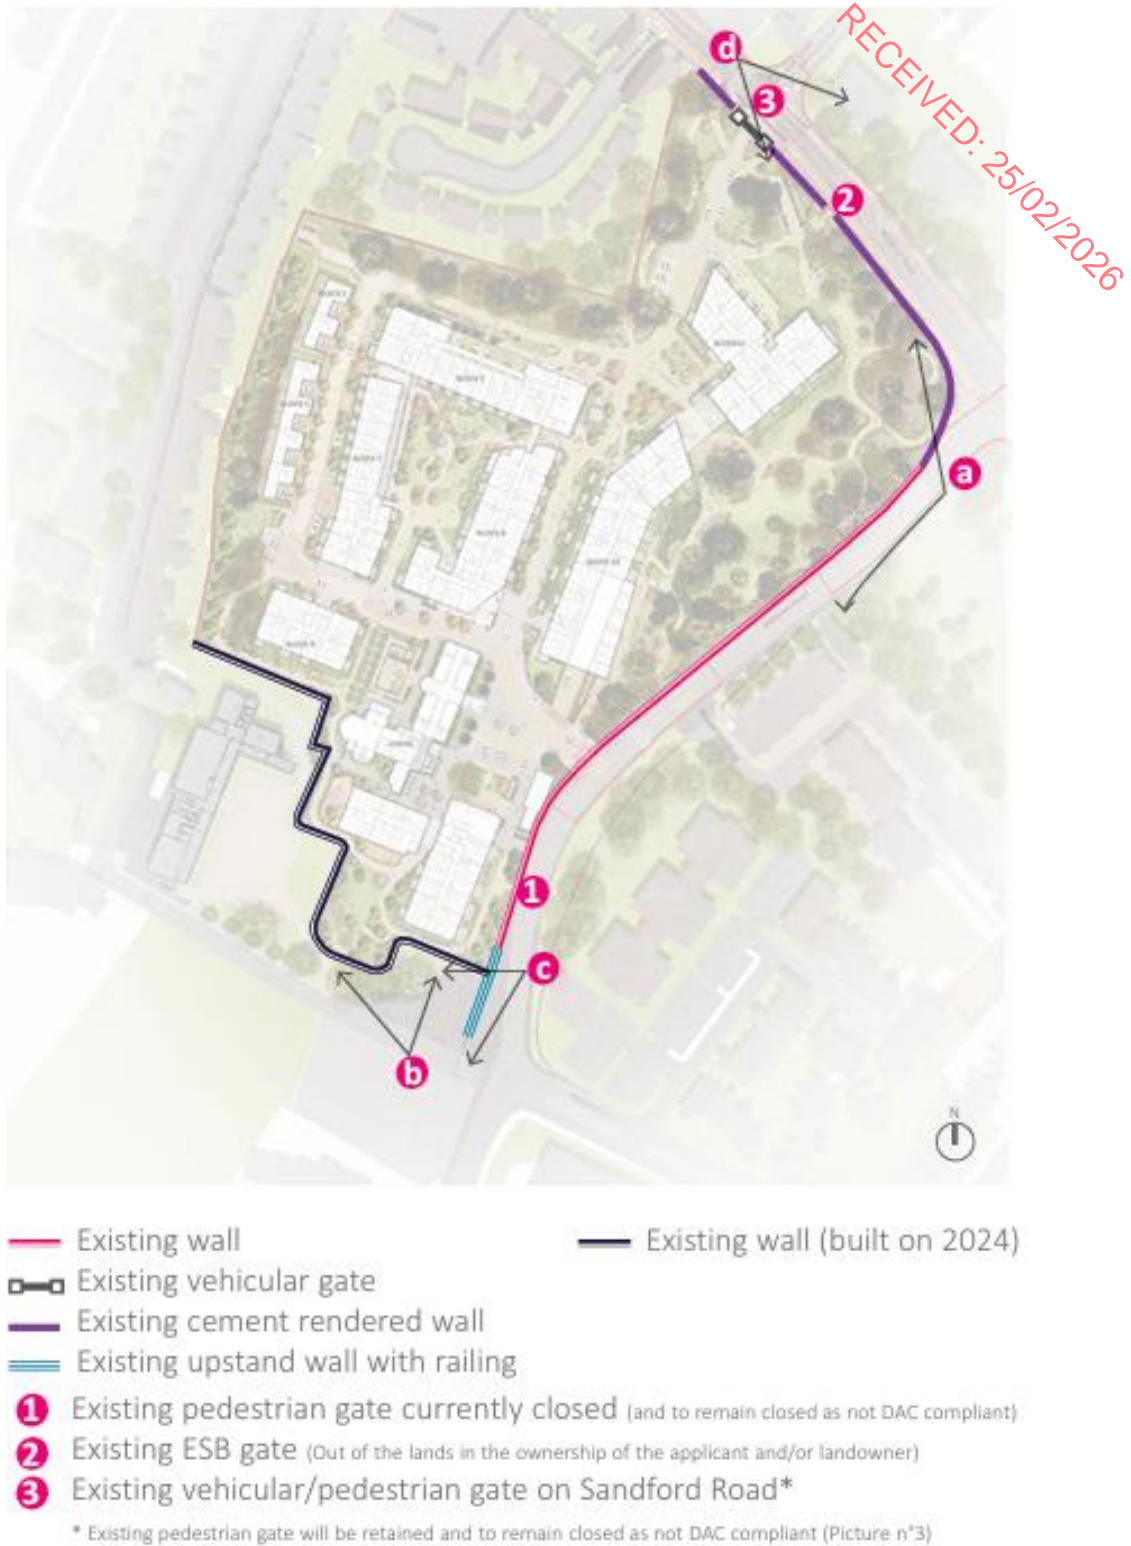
Existing boundaries (Cameo & Partners), page 36 of Landscape Design and Access Statement
